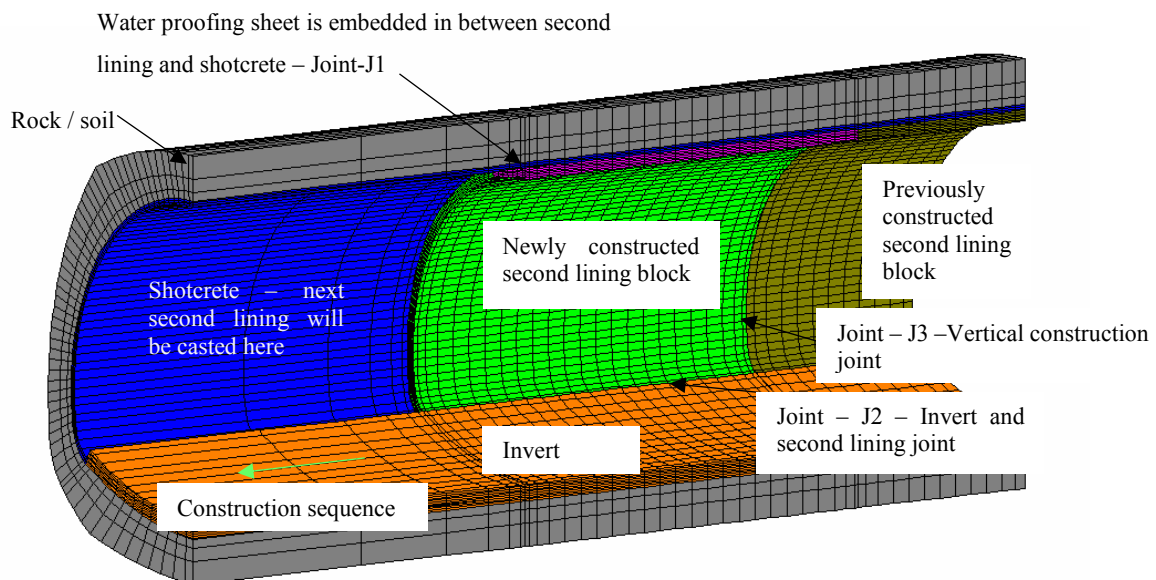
Longitudinal view of an under construction NATM tunnel
